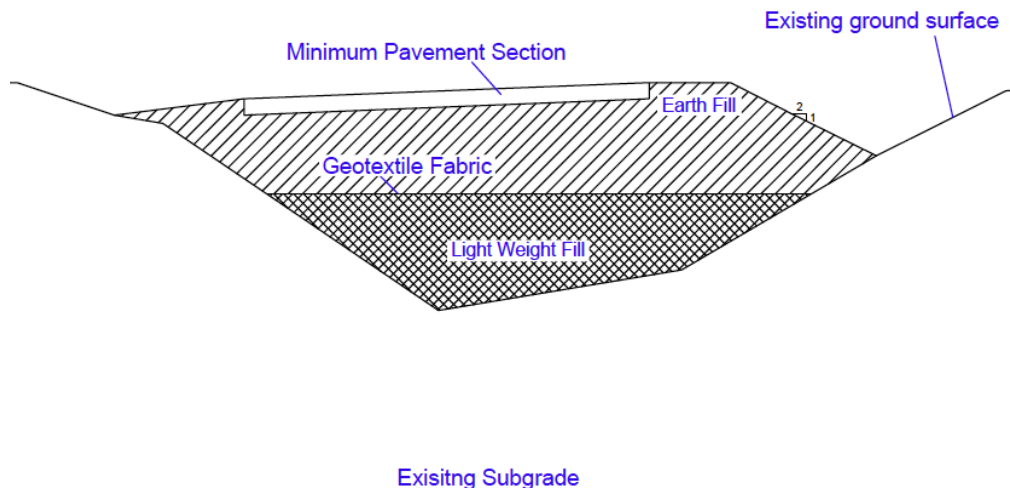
Typical Cross Section of Cowan Boulevard.
